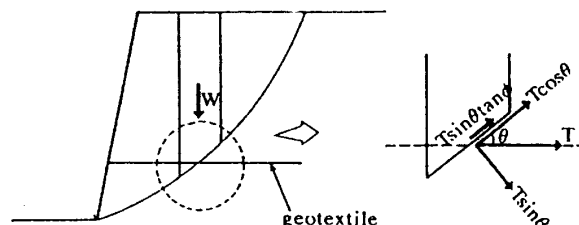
Fellenius method of analyzing reinforced soil structures
